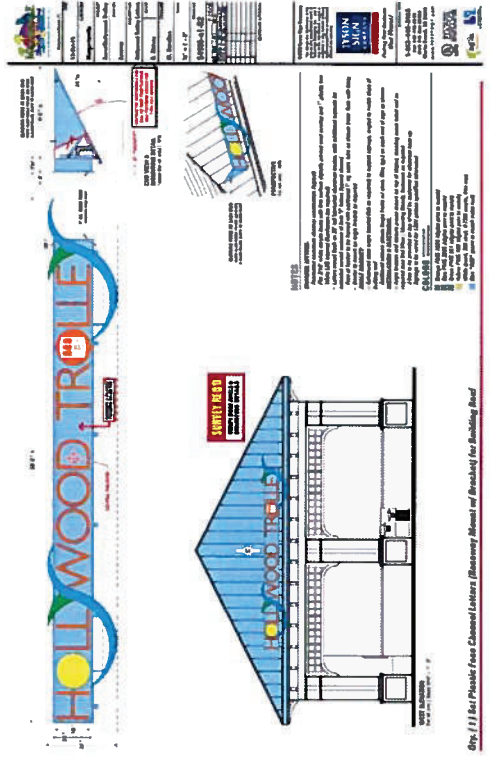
Sign Structure and Signage (Elevation and Plan) for Building Roof
